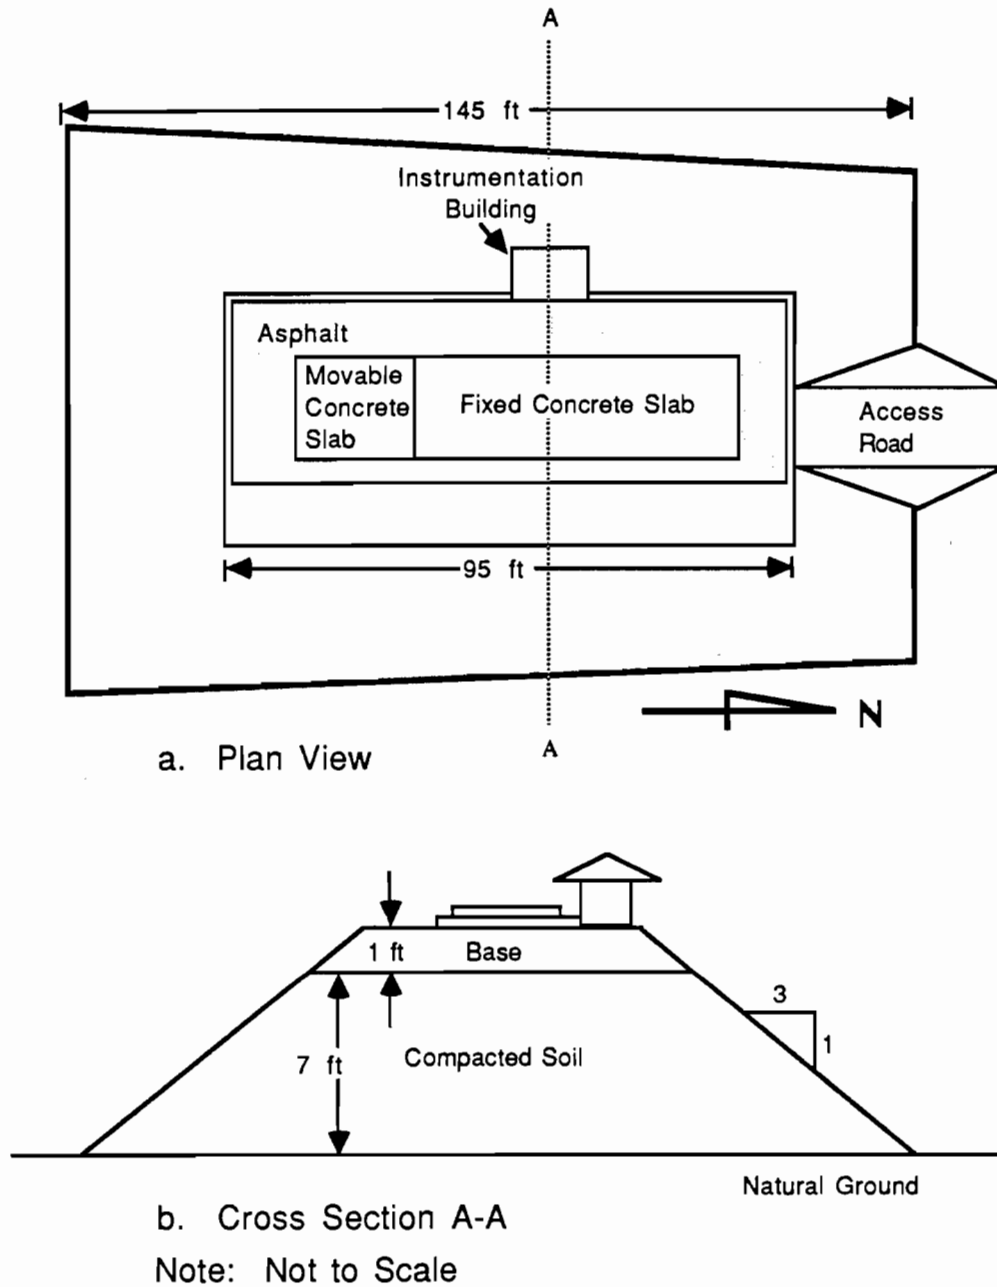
Plan and Cross-Sectional Views of BRC Pavement Facility.
